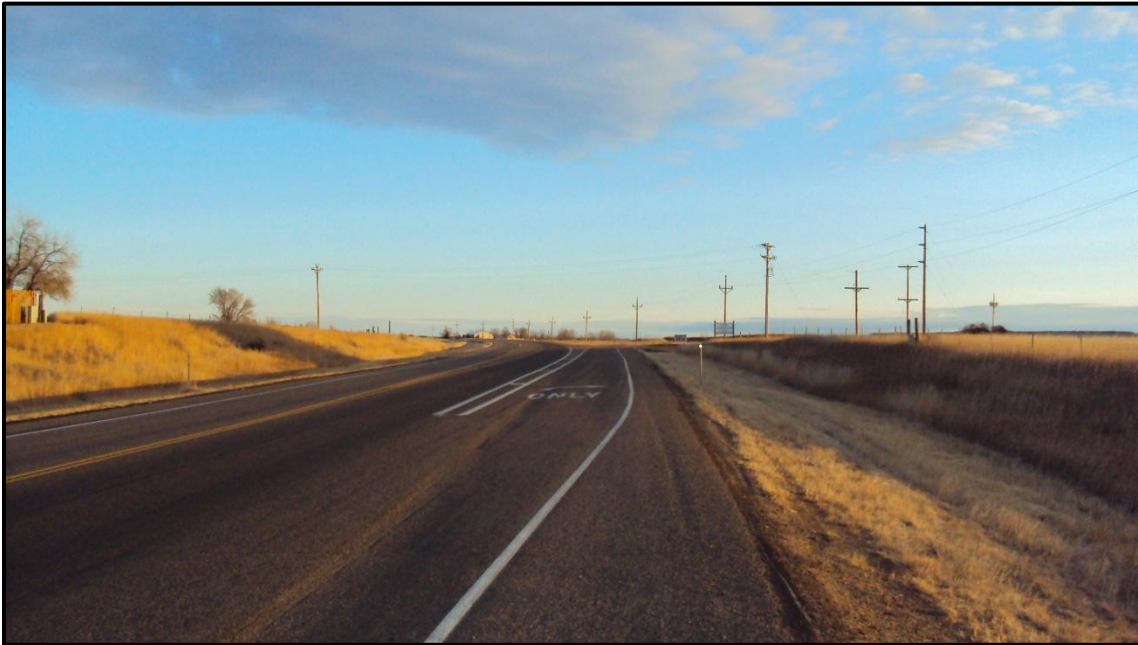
Looking west at a box culvert/wildlife underpass under MT 16. East side slope transitions from 4:1 to 2:1 approximately 18 feet from northbound travel lane. RP 2.4.
